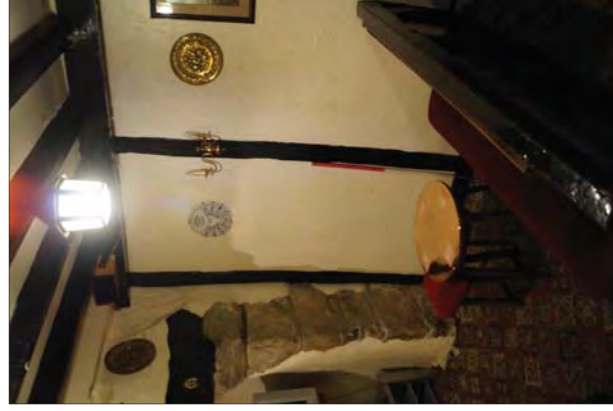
Stone Partition Wall and Corbel Supporting Head Beam
